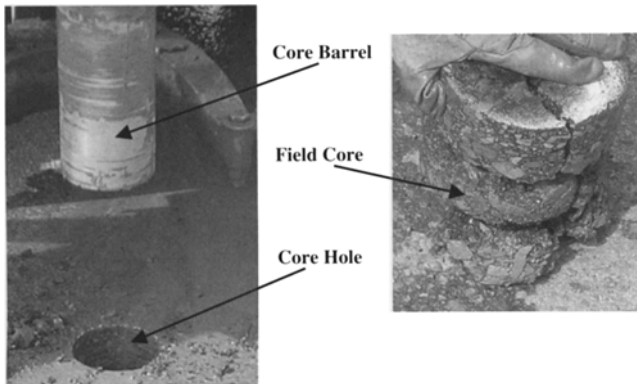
Example of a core obtained at a reflective crack location in a pavement structure
